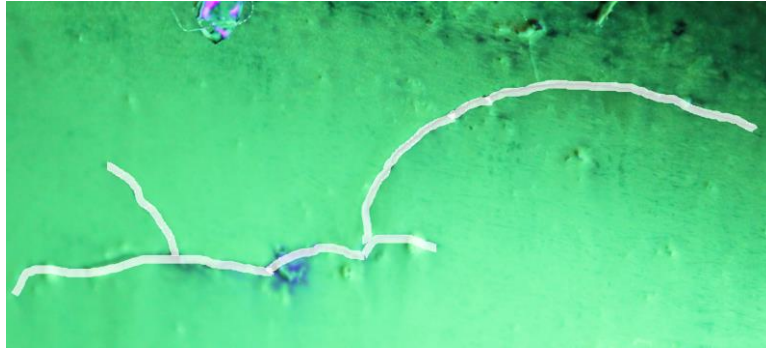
Cracks located on the floorbeam fascia side in Trial 3
